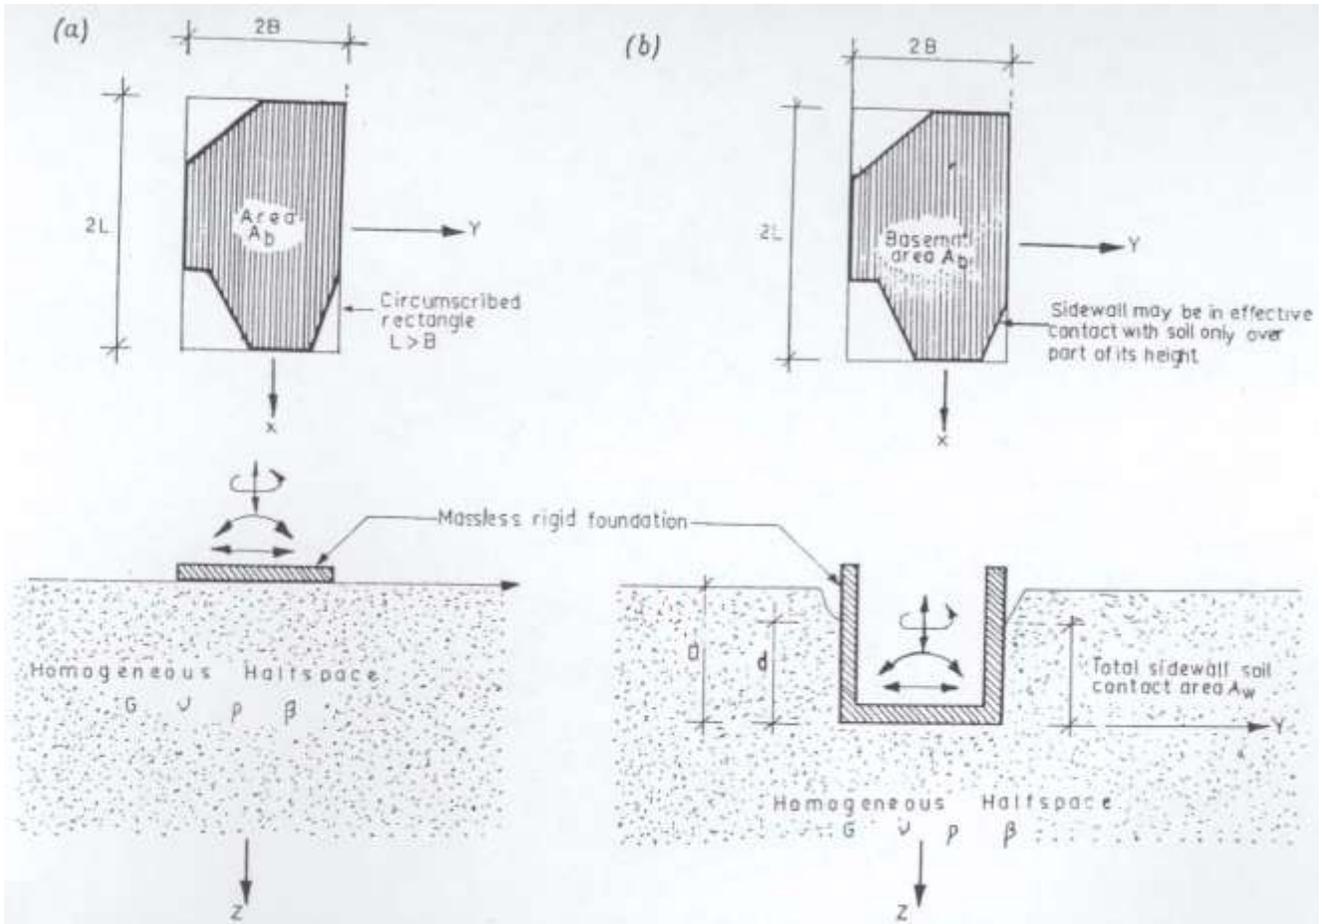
Foundations of arbitrary shape (a) surface foundation, (b) embedded foundation (Gazettas 1991b)
